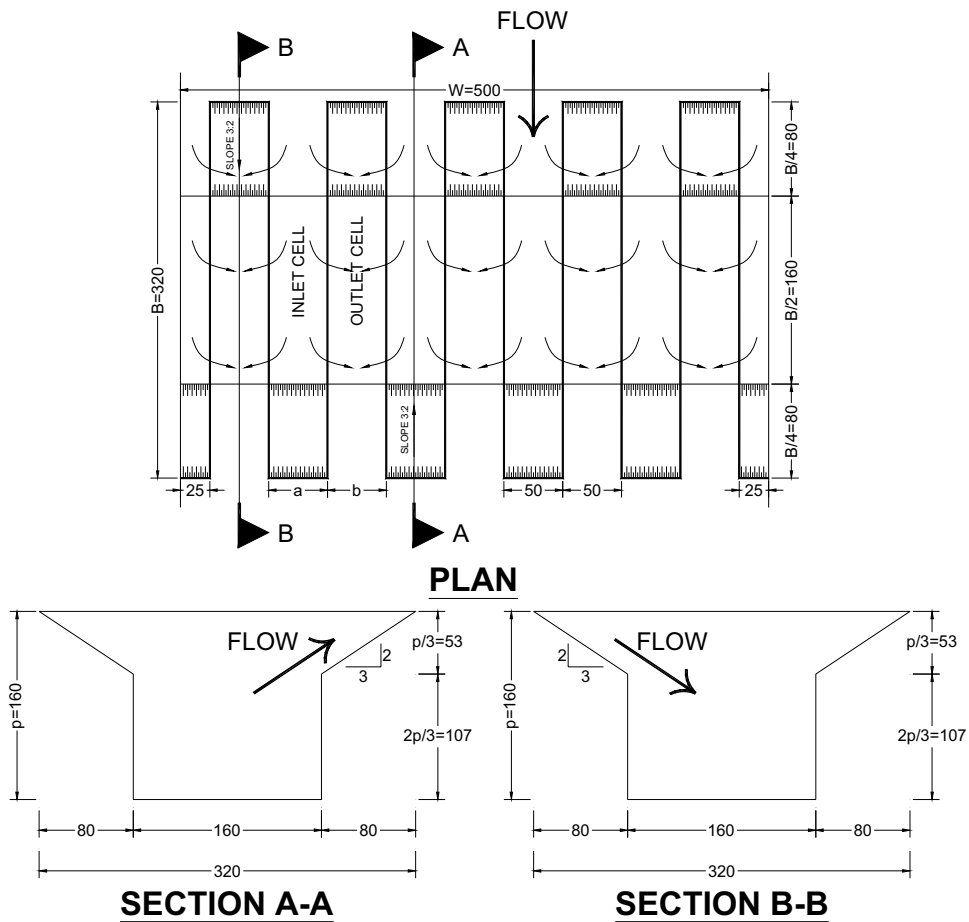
Plan and section of model P_1M_2 (dimensions in mm)
